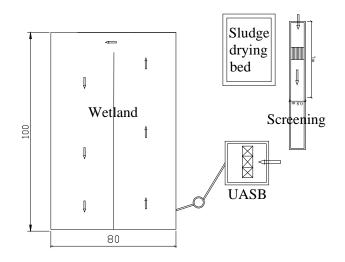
The Layout of Nuba Wastewater Treatment Plant
